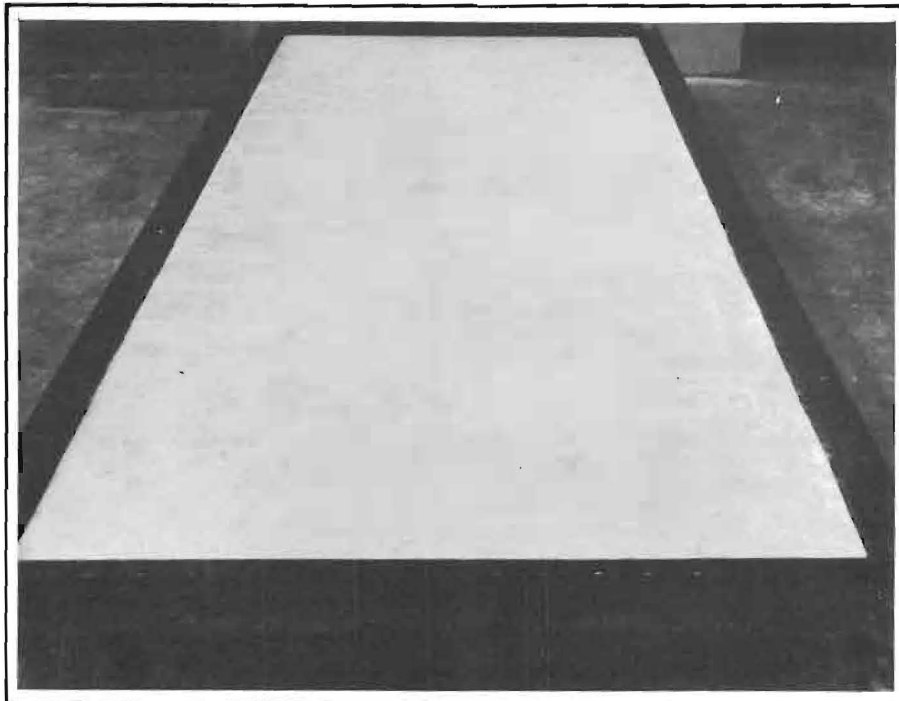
Completed casting bed and stressing frame with the side forms bolted in place.
